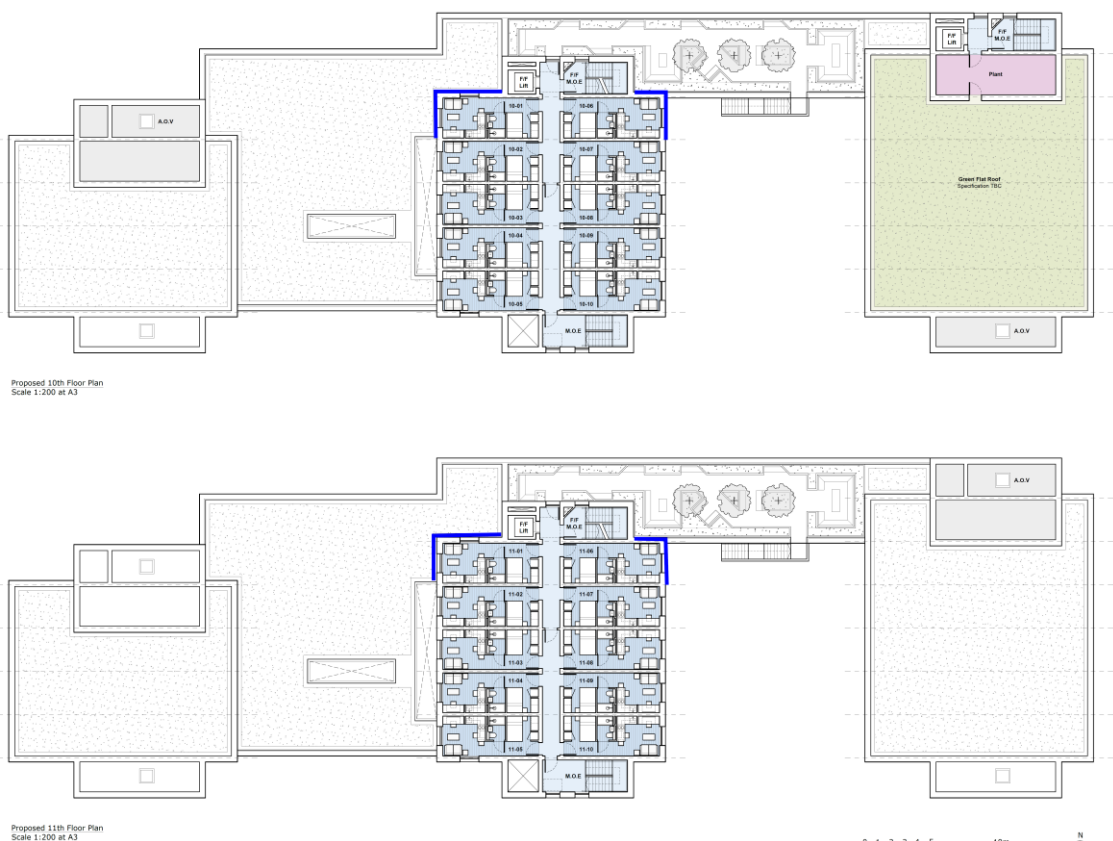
10th & 11th Floor Façades Requiring Additional Sound Insulation Measures
